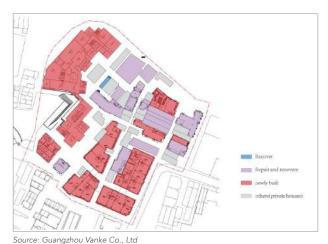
// LAYOUT OF ARCHITECTURE FUNCTIONS IN JIXIANG SECTION
